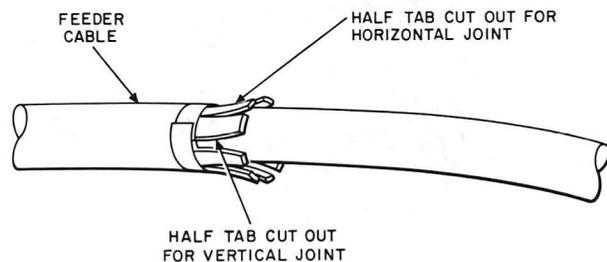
Tab Cutout for Ears of Inner Sheath Clamp
